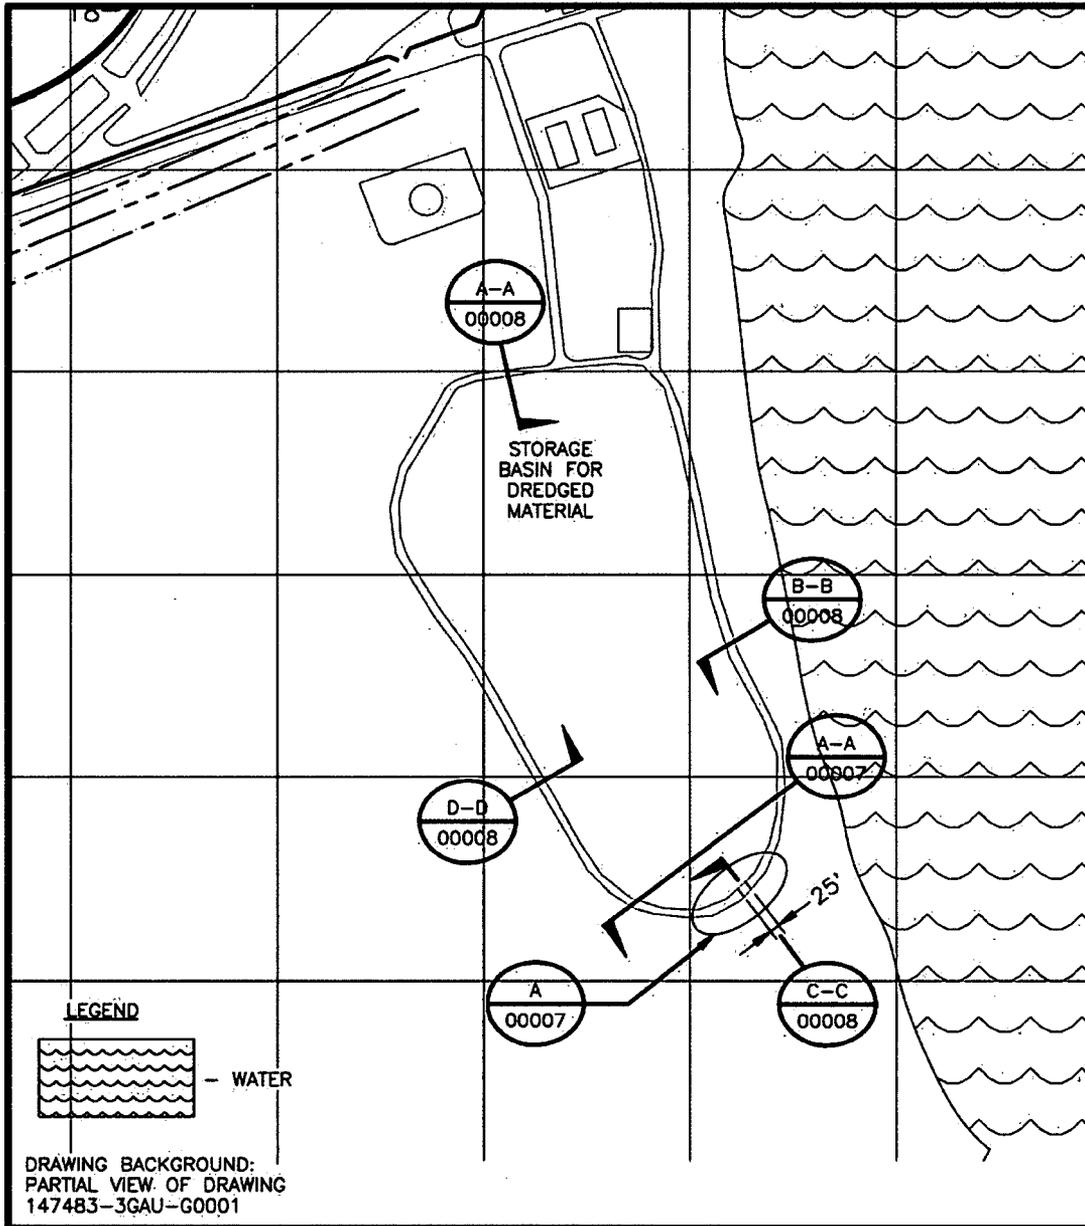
Dredge Disposal Storage Basin Discharge Weir Cross Section
